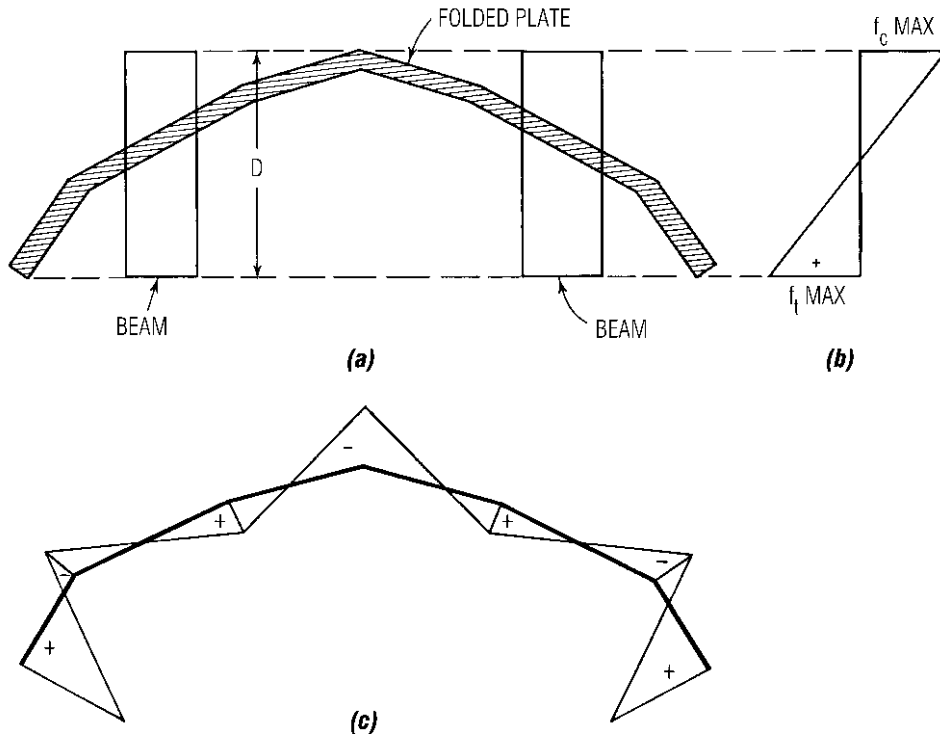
Comparison of folded-plate with beams. (a) Vertical section through a folded-plate roof with superimposition of two solid, rectangular beams that could replace it as roof supports. (b) Stress distribution at midspan of a beam. (c) Longitudinal stress distribution at midspan of the folded-plate roof.
